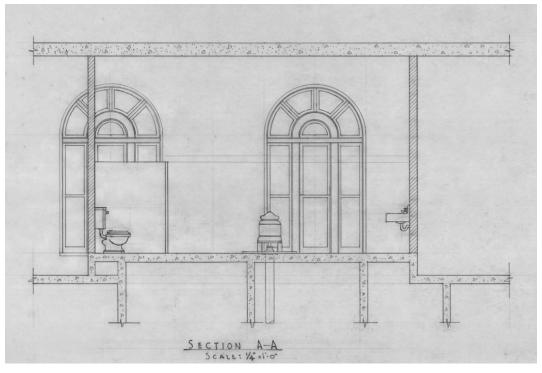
Details of *Miscellaneous Details For Butler's Pantry and Men's Toilet at Pumping Station on Lake Decatur* (AES, Drawing No. 5351, 2 October 1944). Note relationship of stair landing to raised floor of men's toilet room. Kitchen Pantry was also reconfigured at this time.
